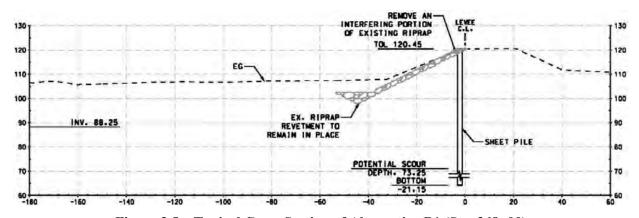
Typical Cross Section of Alternative B1 (Sta. 368+00)
